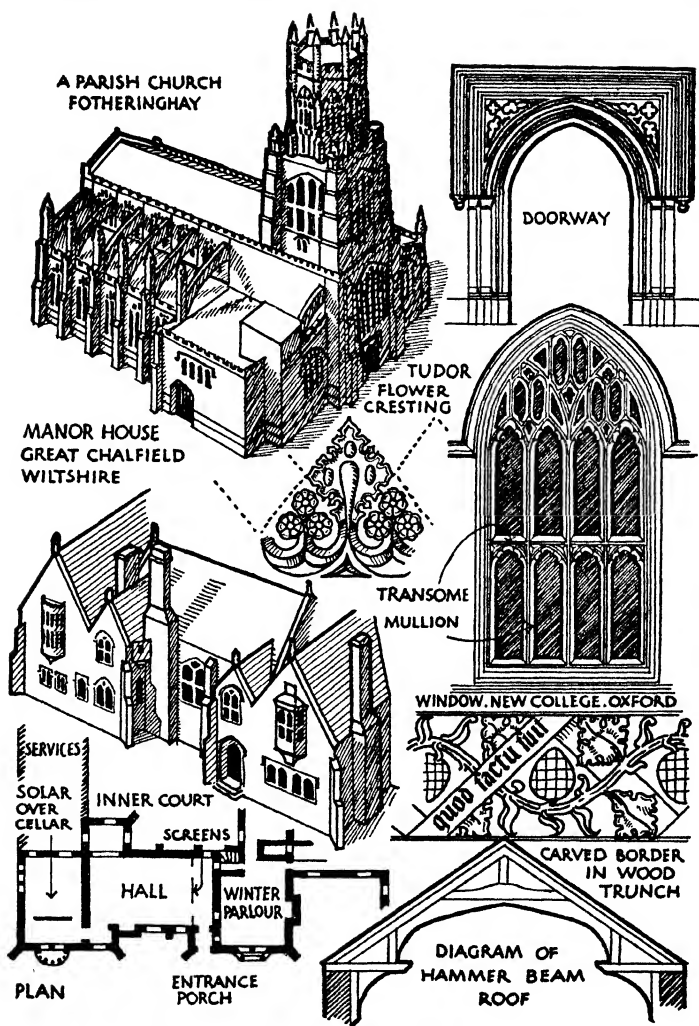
BUILDINGS AND BUILDING DETAILS IN PERPENDICULAR STYLE
